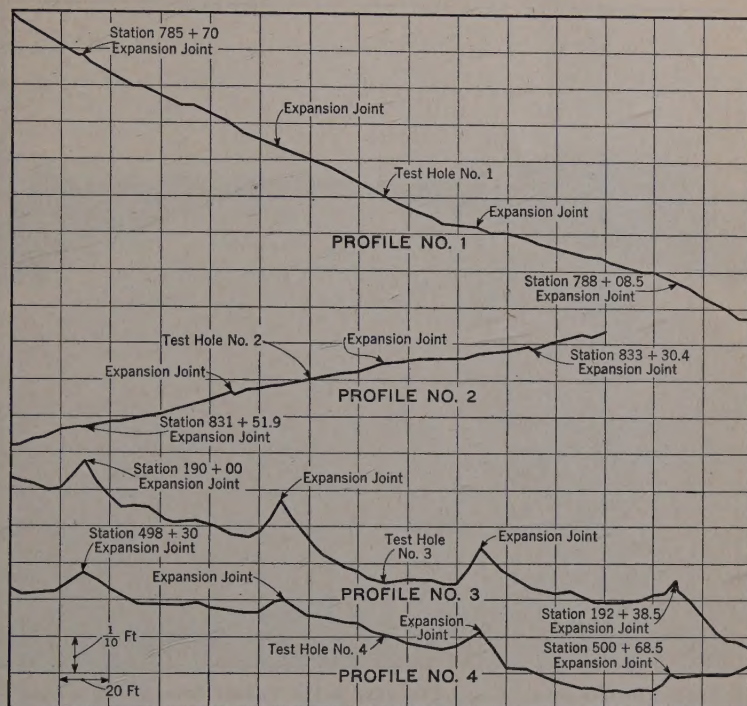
PROFILE AT CENTER LINE OF CONCRETE PAVEMENT
